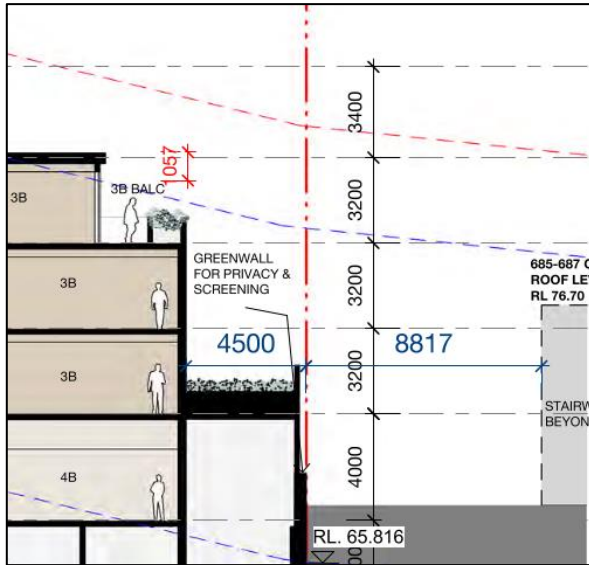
Extract of the section adjoining 658-687 Old South Head Road to the north of the site
